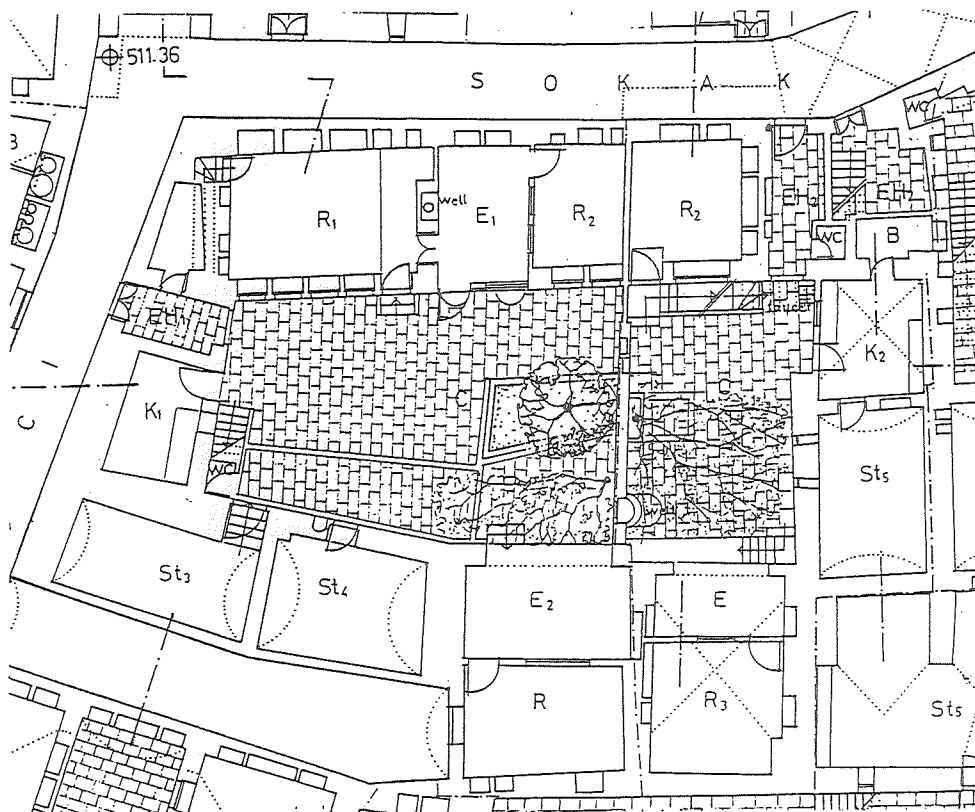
Ground floor plan of the "haremlik" part of Yorgancı House.
